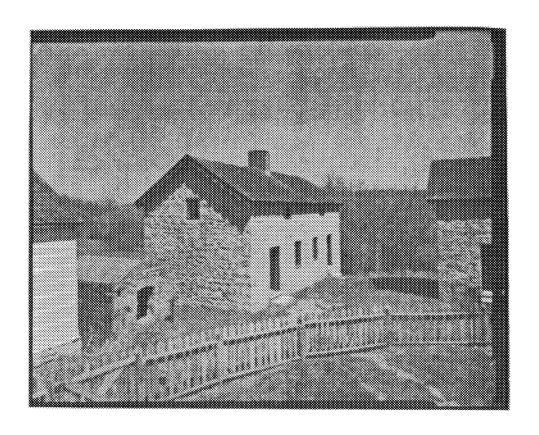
Hampton Quarter 2, perspective of southwest and northwest elevations, looking east.
